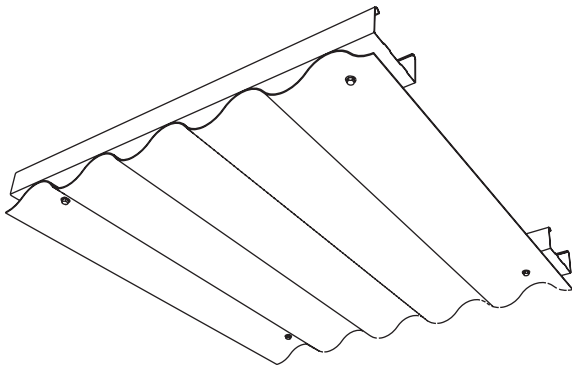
Accentuated longitudinal joint; Example A (For transverse joint, see Fig. 19, lay-in assembly)
